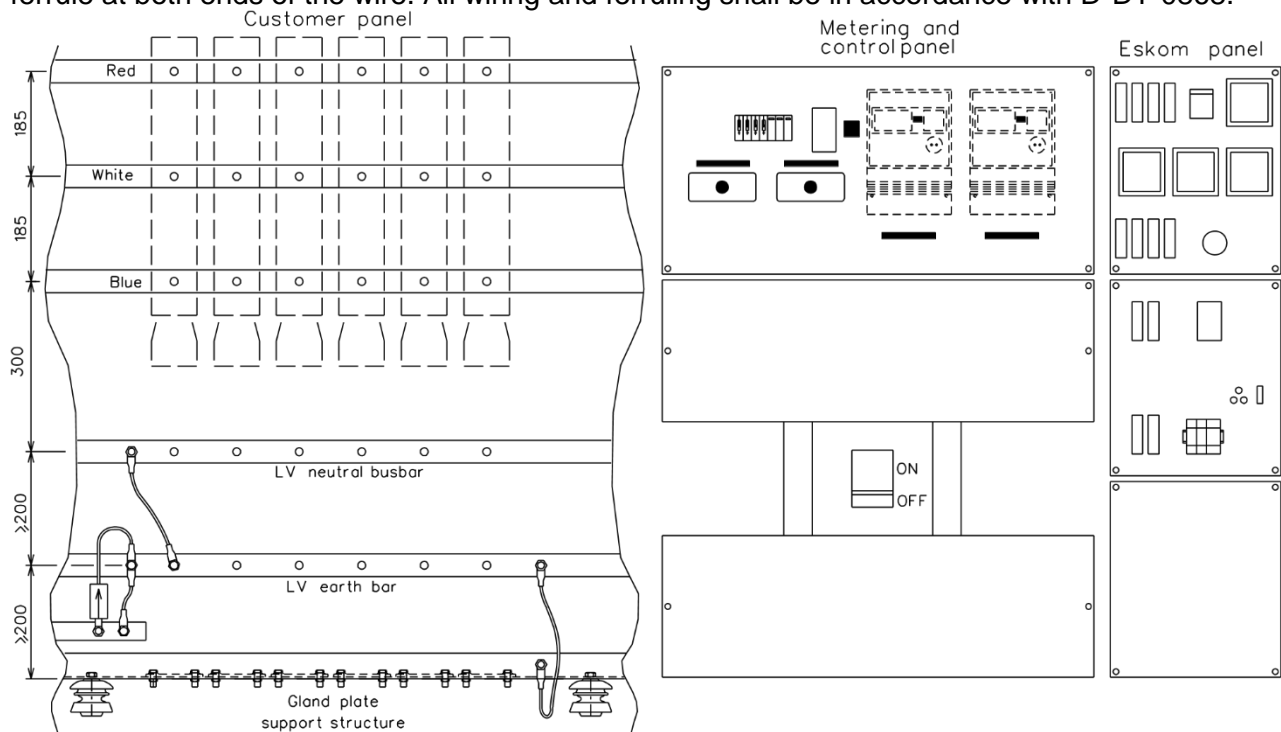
LV ASSEMBLY design – modify metering panel based on D-DT-1013 revision
